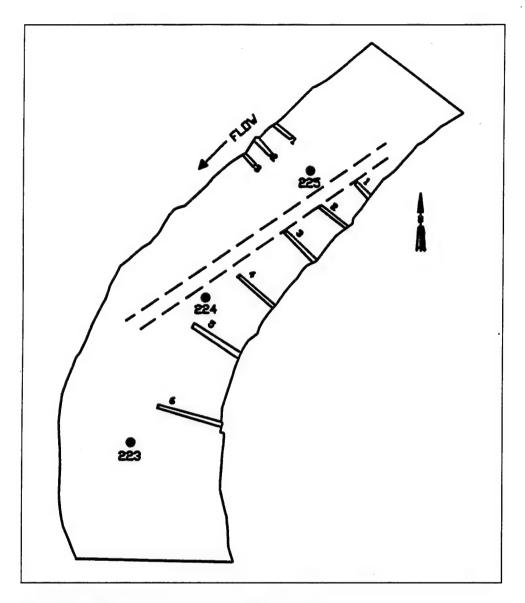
Plans 2, 3, 4, 5, and 6 dike layouts
